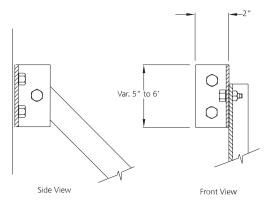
Typical joint for Wall (WS), Horizontal (HS) and Anchor Plate support(AP)
